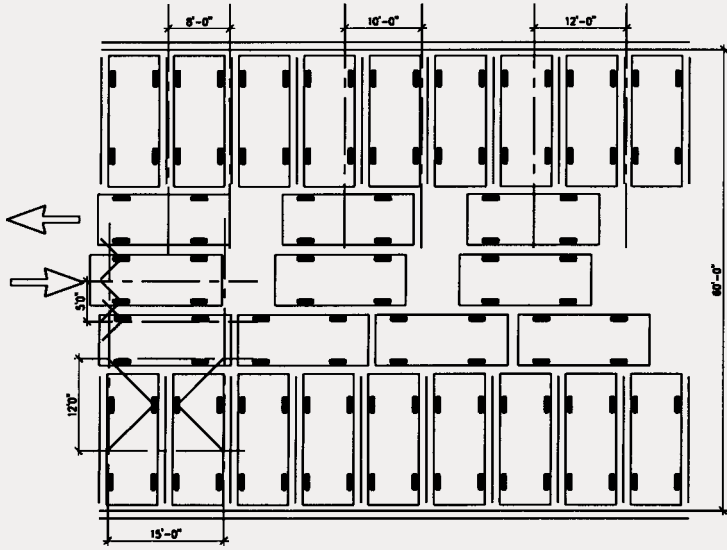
Typical vehicle layout for stacked/valet parking structures
